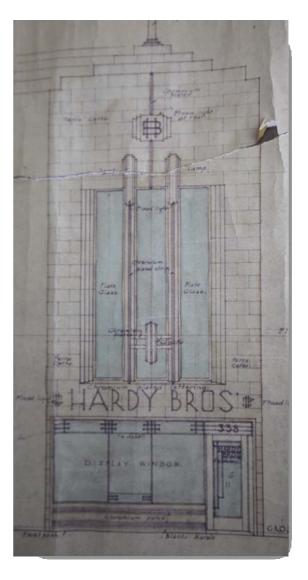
Building Permit Application street elevation 1933 with terracotta façade and back lit company logo
